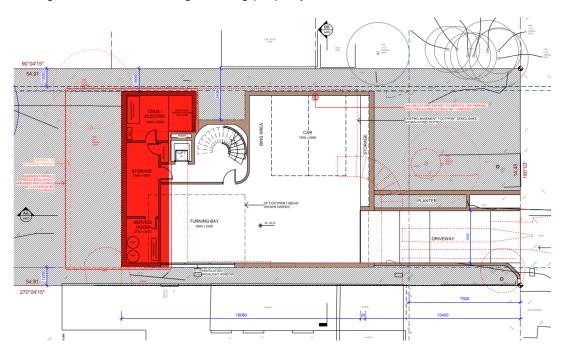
Proposed Deletion of Basement Area (Source: Architectural Plans drawn over by Council's Planner)
